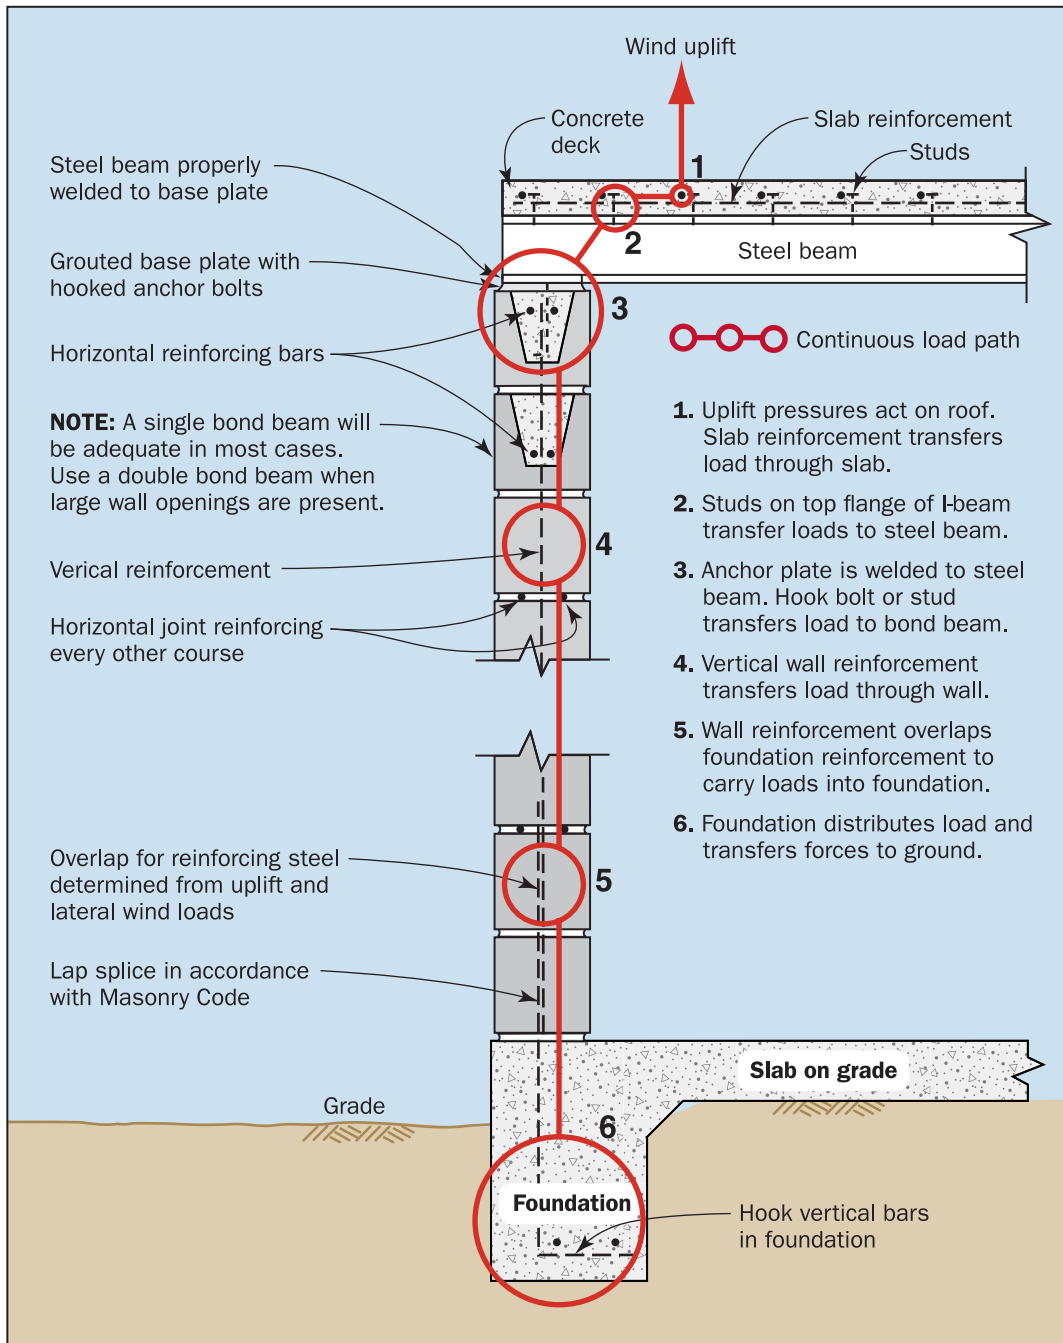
Continuous load path in a reinforced masonry building with a concrete roof deck
